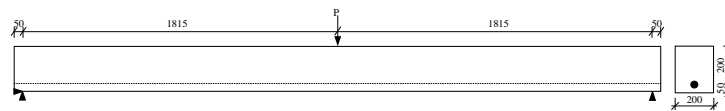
Dimensions and tendon layout of beam II (Unit: mm)
